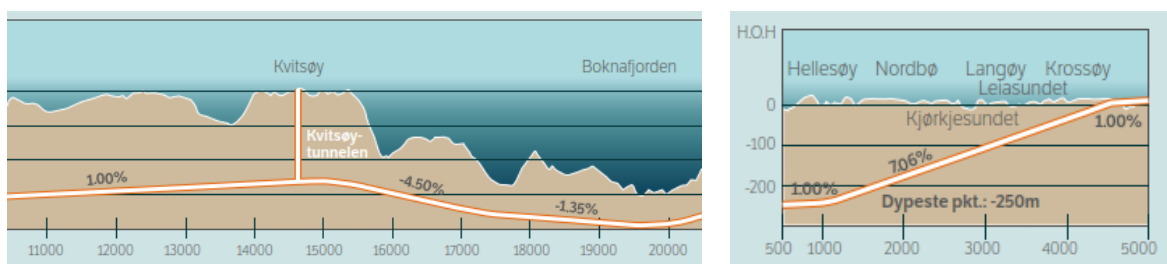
Longitudinal sections at Rogfast E02, showing the general geometrical layout for the main tunnel (left) and the Kvitsøy access (right) [4]
